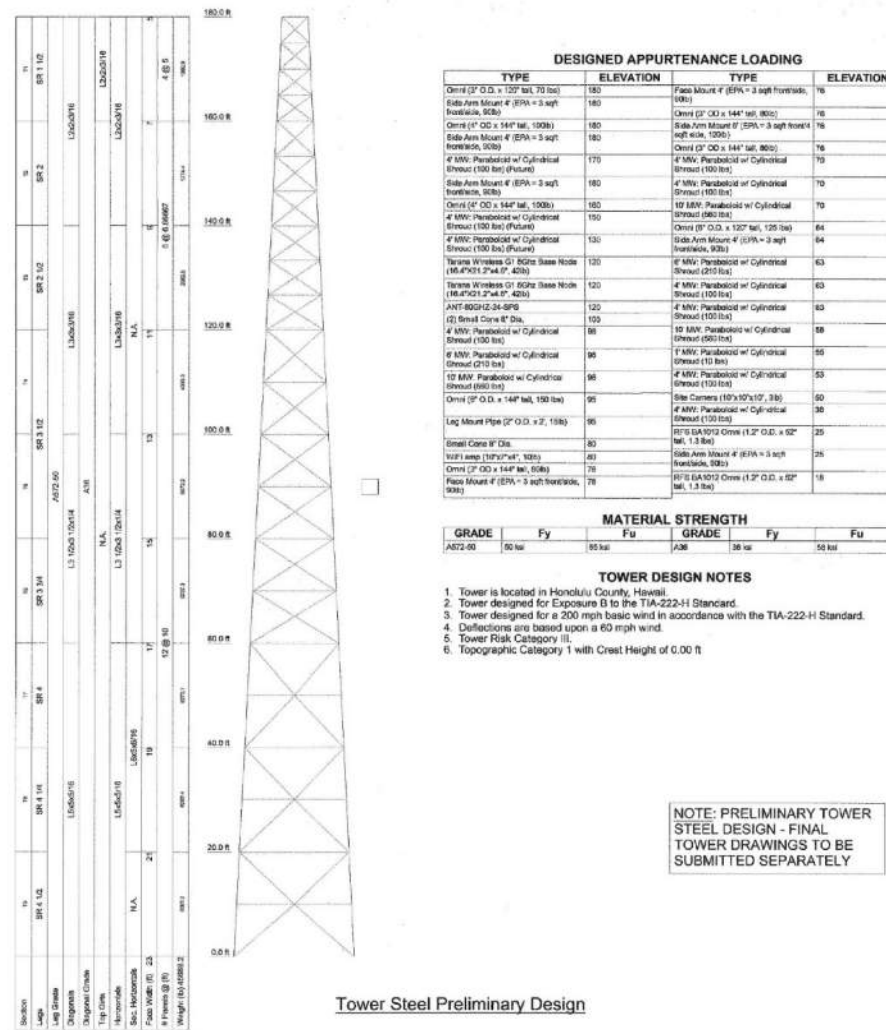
Tower Elevation – ‘A’ & ‘B’ Face View
